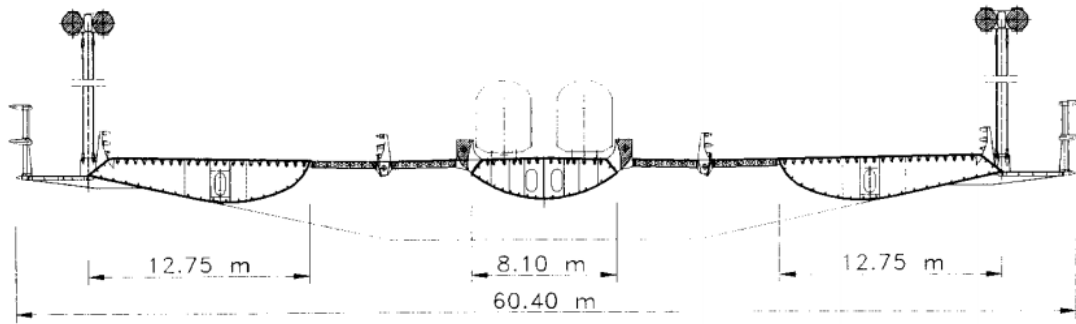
Cross-section of the Messina Strait Bridge deck[63]
